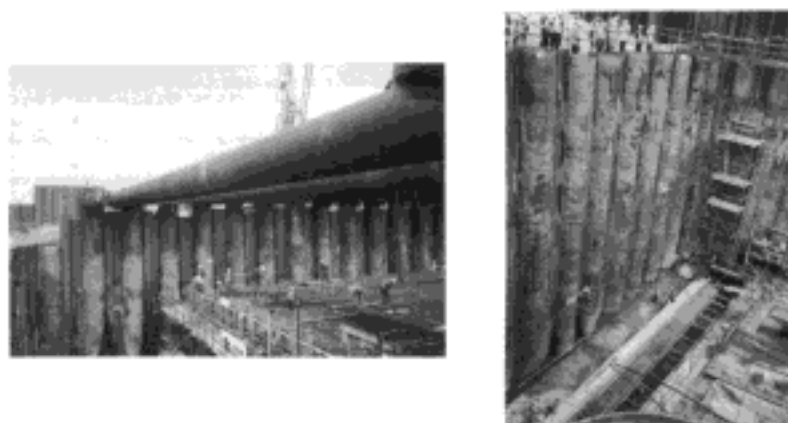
Combined tubular steel and steel sheet pile wall, River Medway crossing, UK (courtesy of Tarmac)
